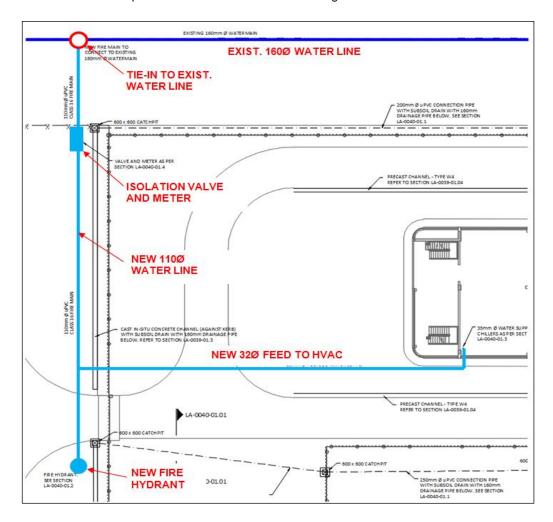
Fire Hydrant and HVAC Water Feed Connection
